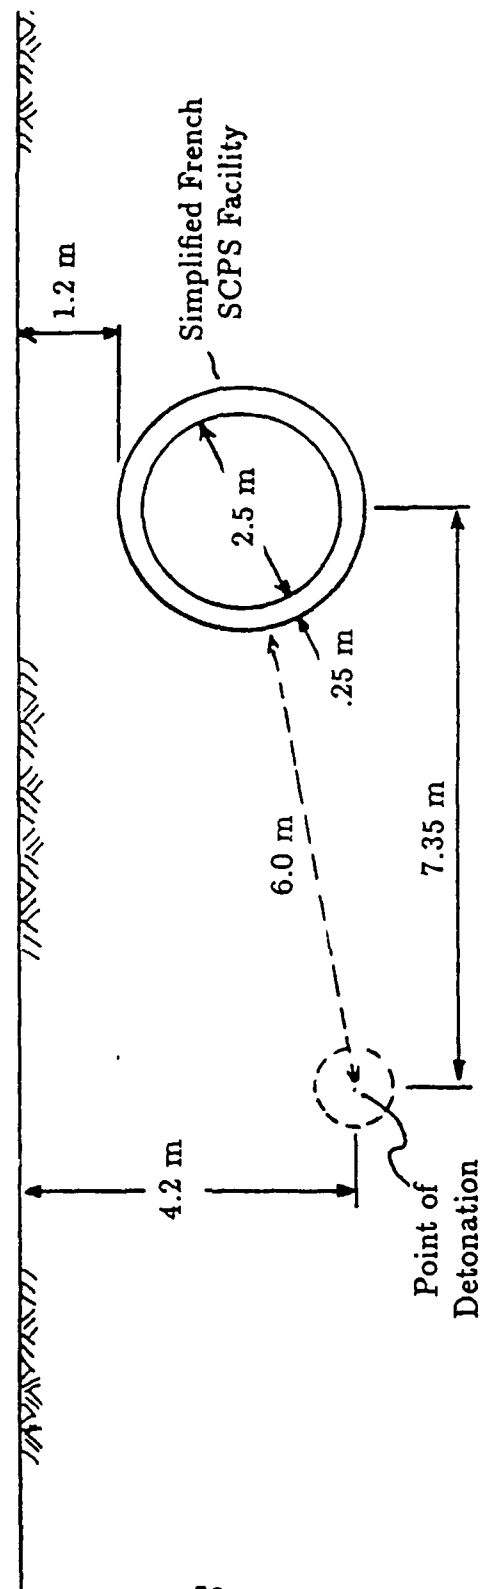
Full-Scale Prototype System, 500 kg TNT (Elevation View).
